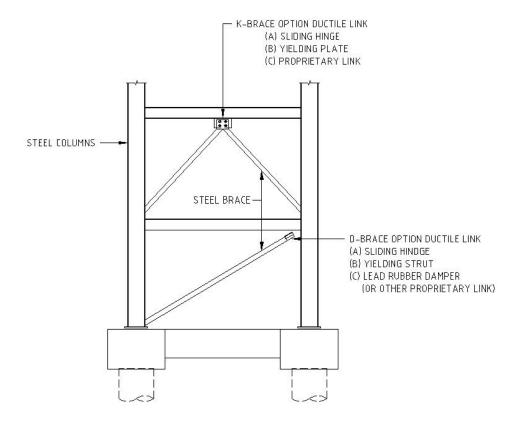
Different Options for a Ductile Steel Braced Frames
